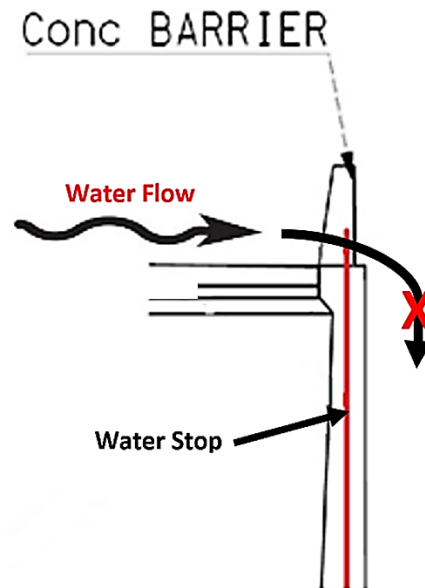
Water Stop Described and Illustrated in Contract Plans
